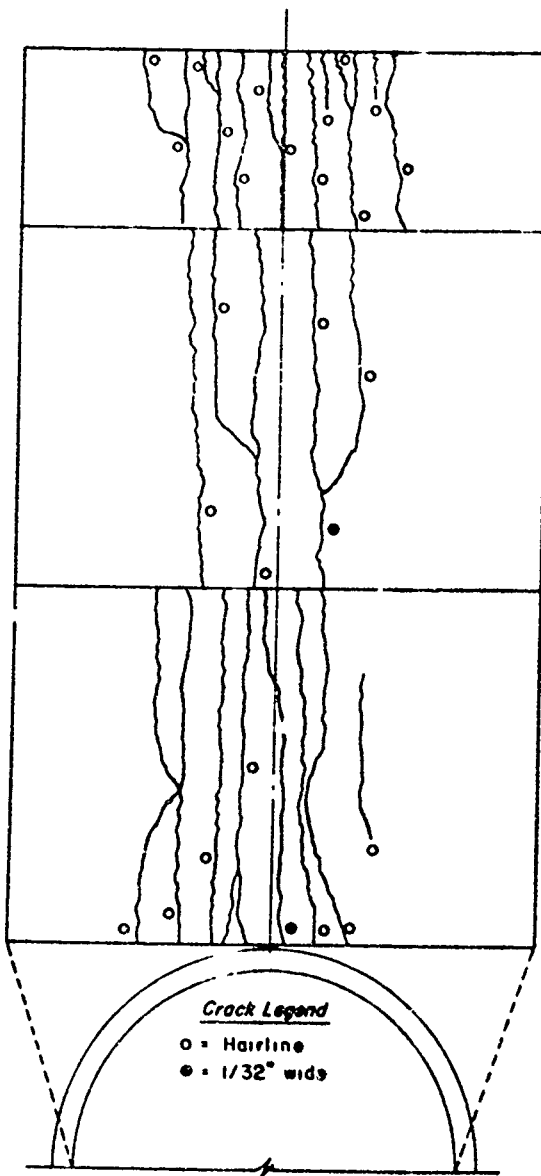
Crack survey of top half, developed; concrete Conduit 3.2e.
